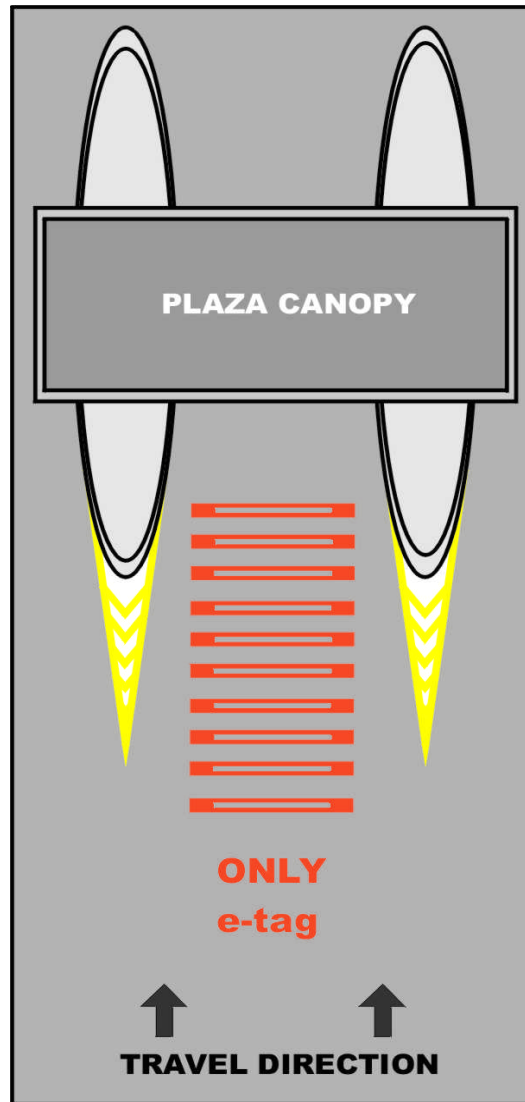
Typical drawing for road markings for dedicated ETC or express lanes
